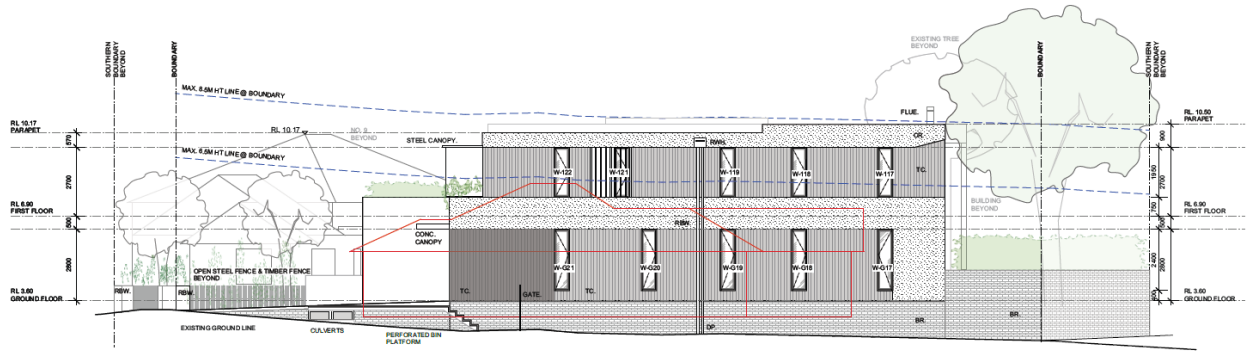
Proposed north elevation. The footprint of the existing dwelling is outlined in red
